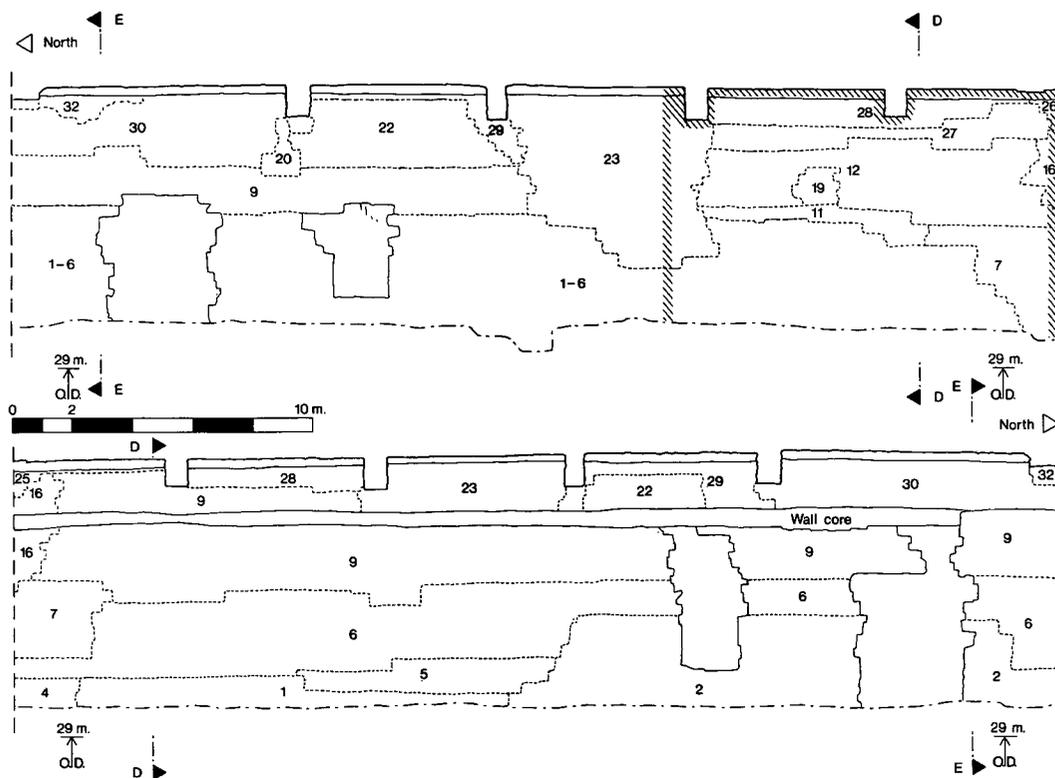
Town Wall, Orchard Street: phased elevation section 3–4.
